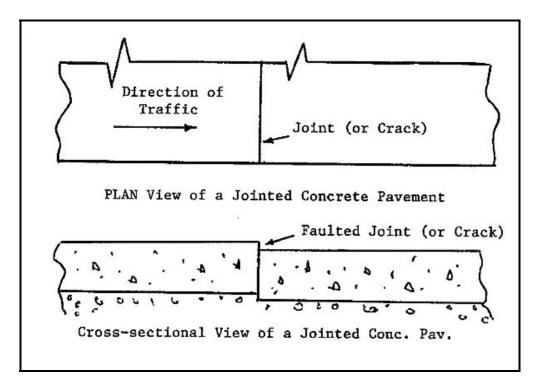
Sketch showing Faulting in Jointed Concrete Pavement
